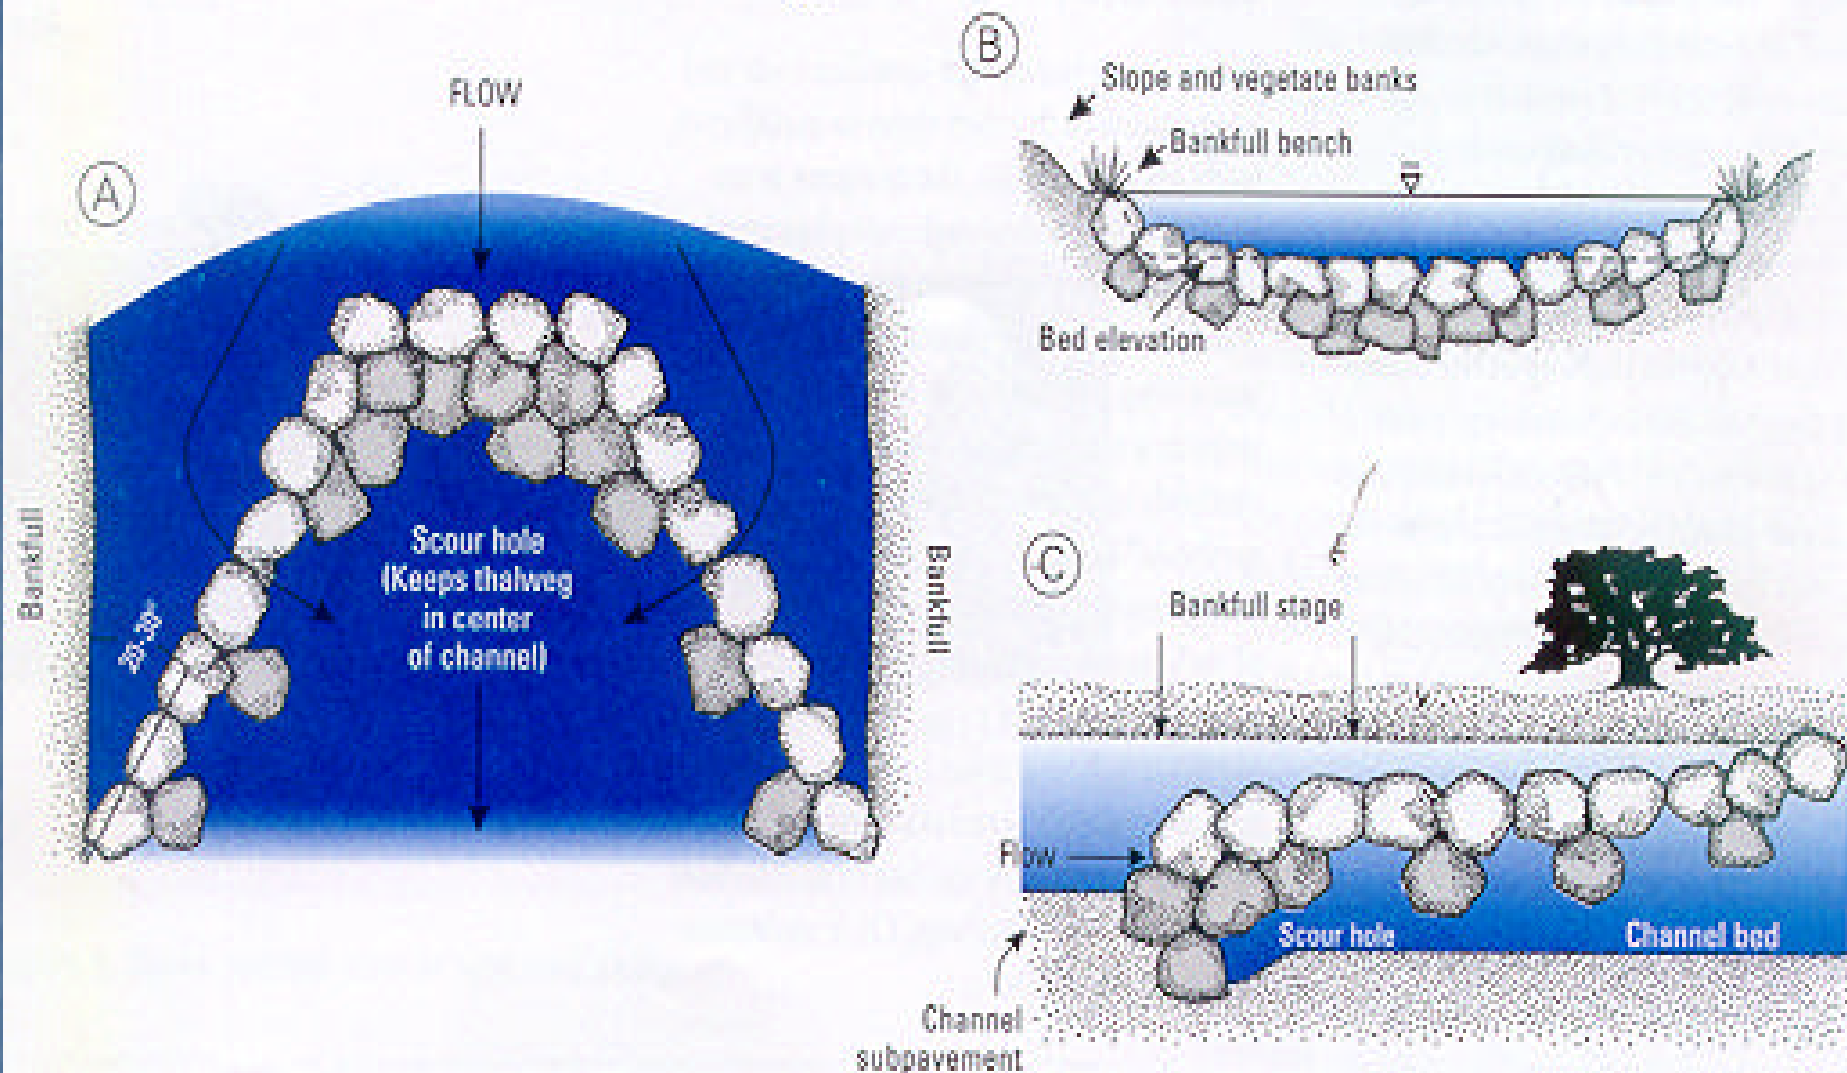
(a) Plan view, (b) cross-section, and (c) profile views of cross vane.
